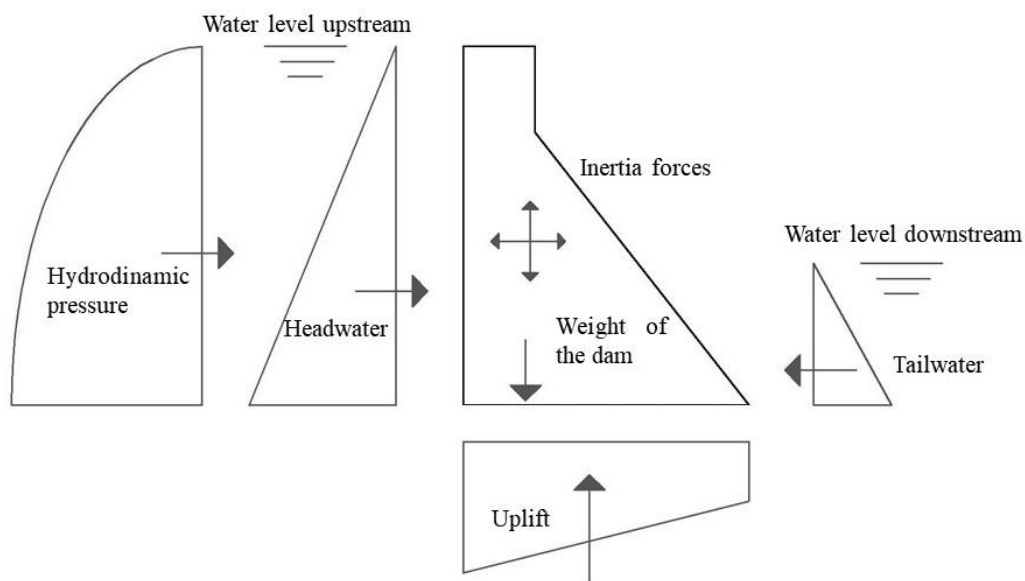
Main forces acting on a concrete gravity dam (adapted from www.hydroworld.com)
